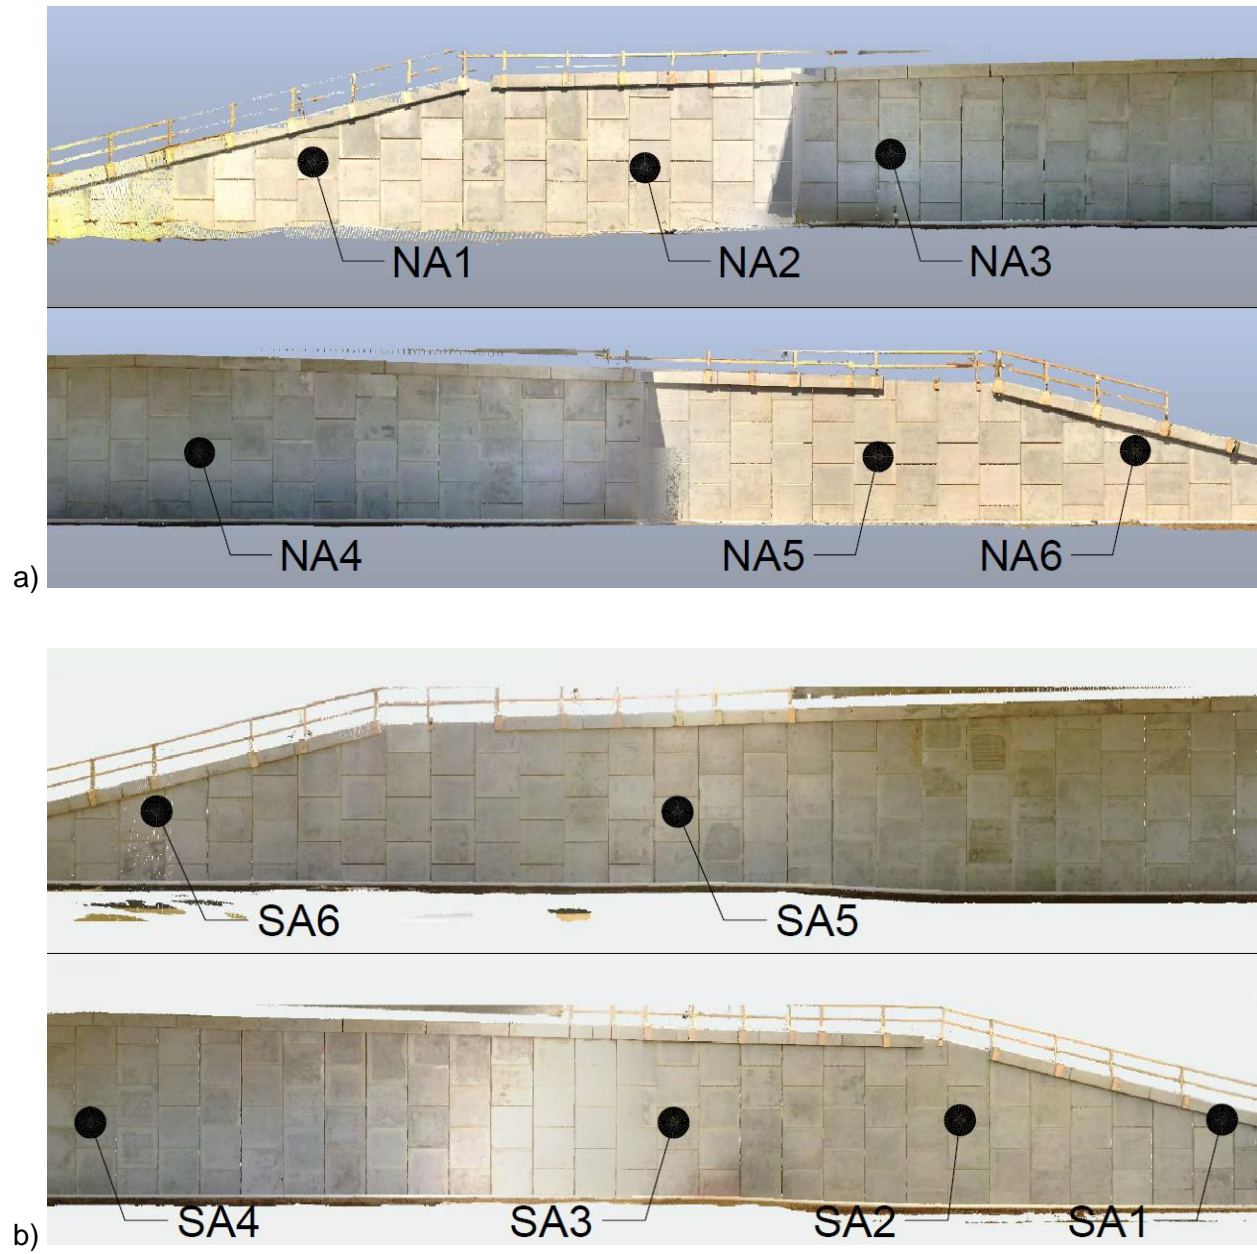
Rod and Level Surveying Locations for a) North Abutment, and b) South Abutment
